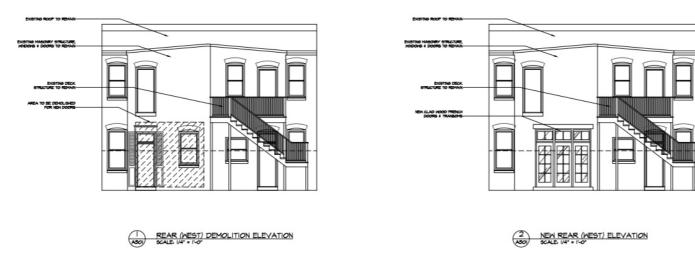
Existing rear elevation with area to be demolished on left; proposed elevation on right.
